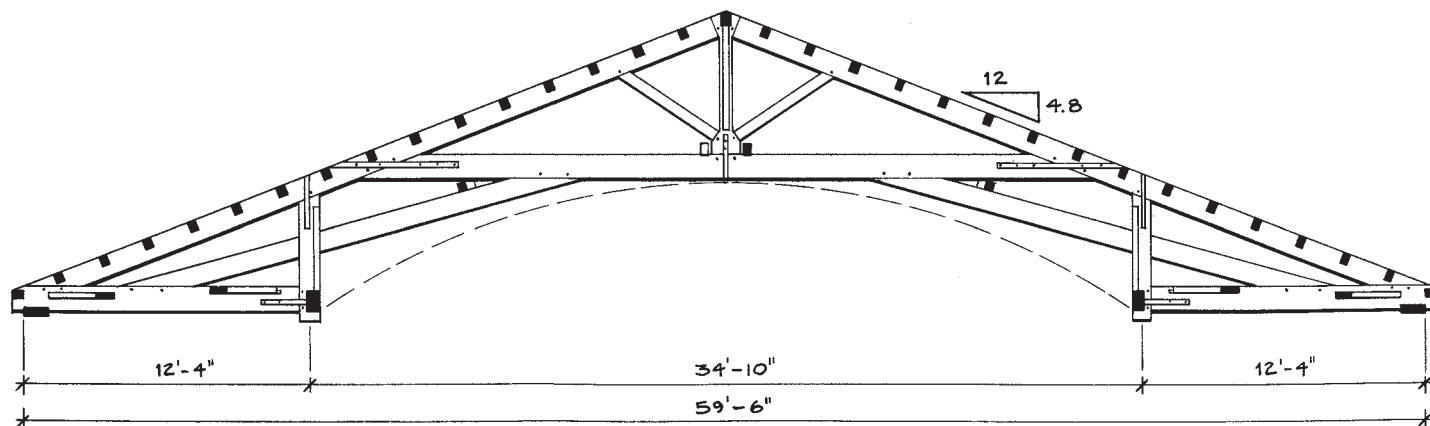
Raised bottom chord truss at St. John's Church, Portsmouth, N.H. (1807), an exceptional form within an exceptional truss form.
